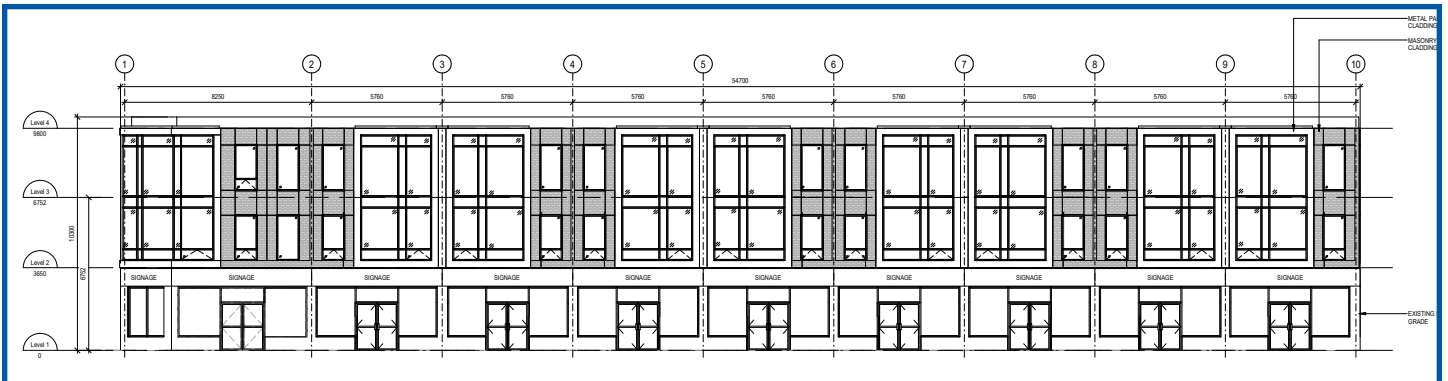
Airport Road Elevation - 7198 Airport Road
